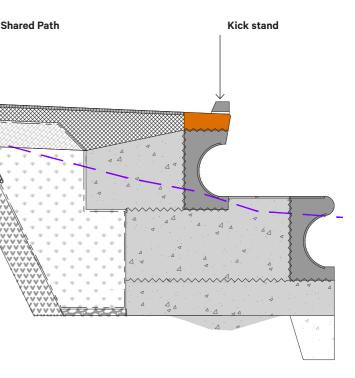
Single curved seawall with bench (type C1L) and stormwater outfall penetration.
